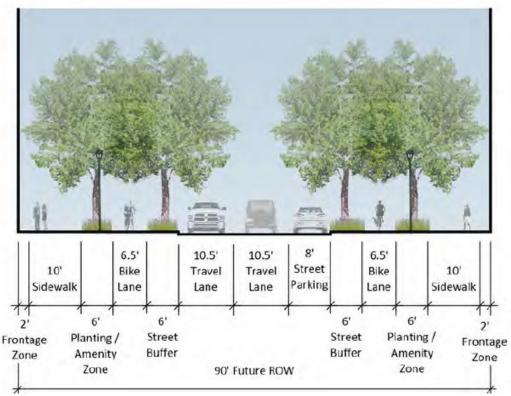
Marinelli Road Final Cross Section (facing west towards Rockville Pike) –
